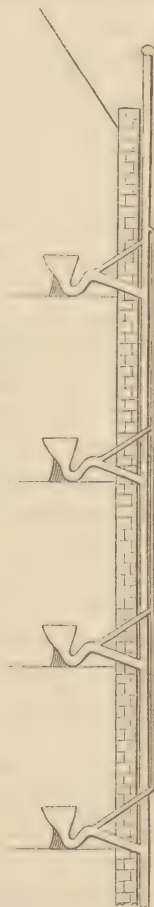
SOIL PIPE AND VENTILATOR, WITH ANTI-SIPHONAGE PIPES FROM THE WATER-CLOSET BRANCHES.
